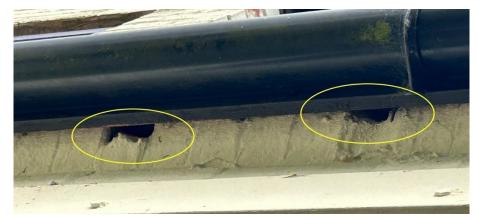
Gaps around hanging tiles and lead on dormer on the property's northern elevation
